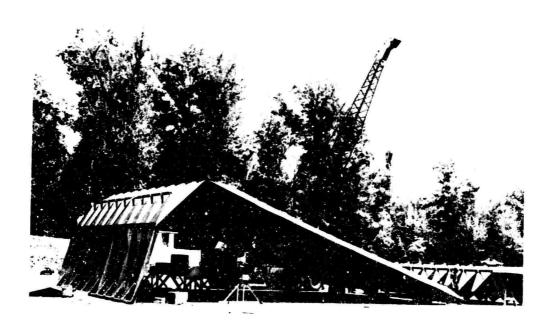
Sidewall-roof complete – preparation for crane lift to join second sidewall.
